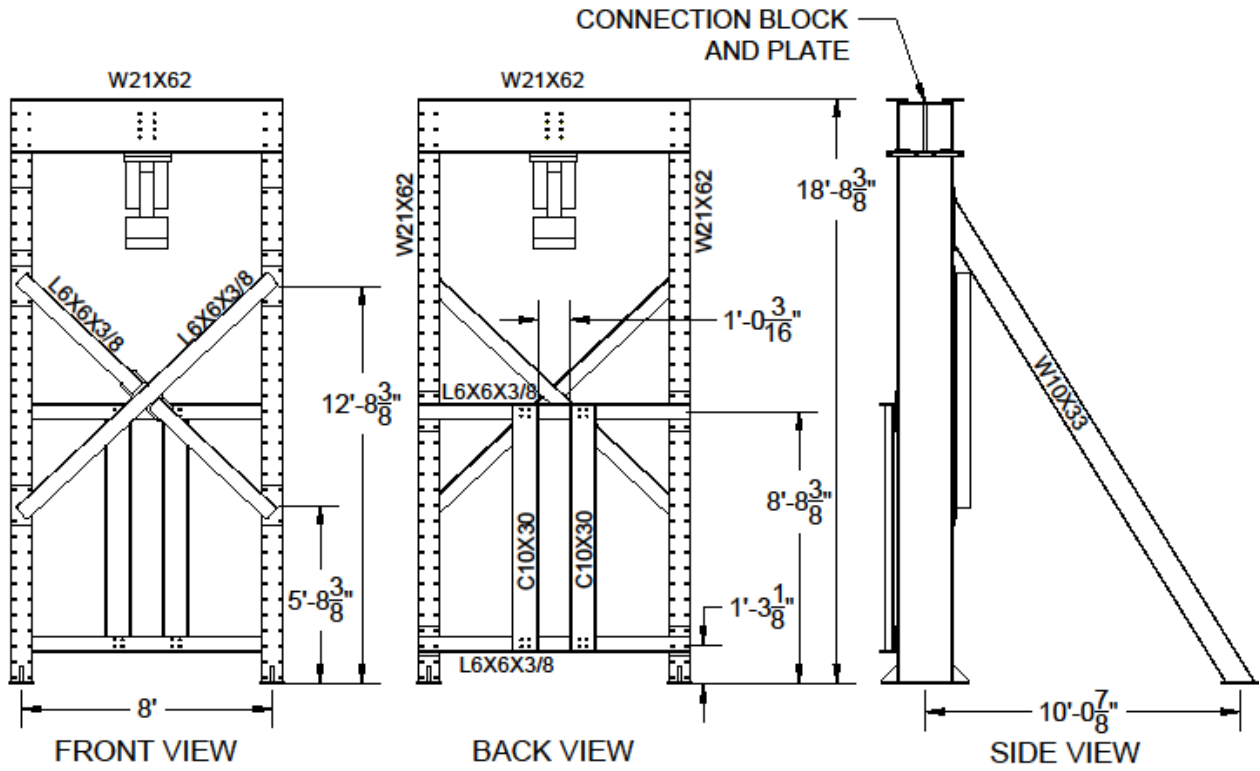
Frame 3, Actuator Frame, Members and Key Dimensions
